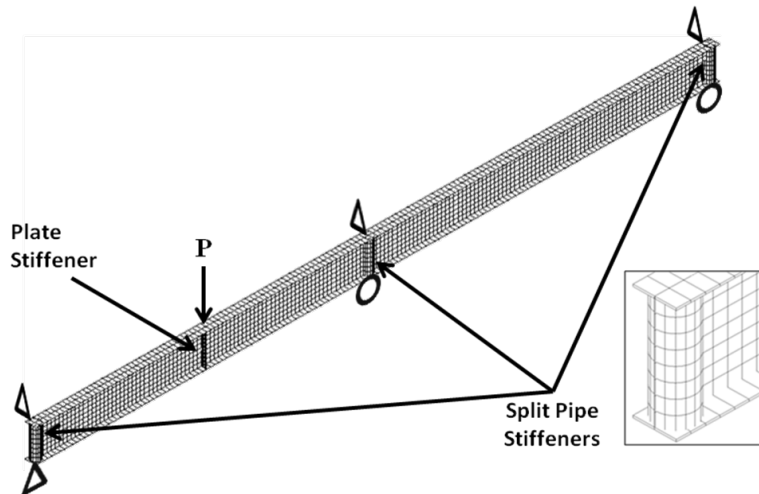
Two Span Girder Model with Split-Pipe Bearing Stiffeners (inset)
